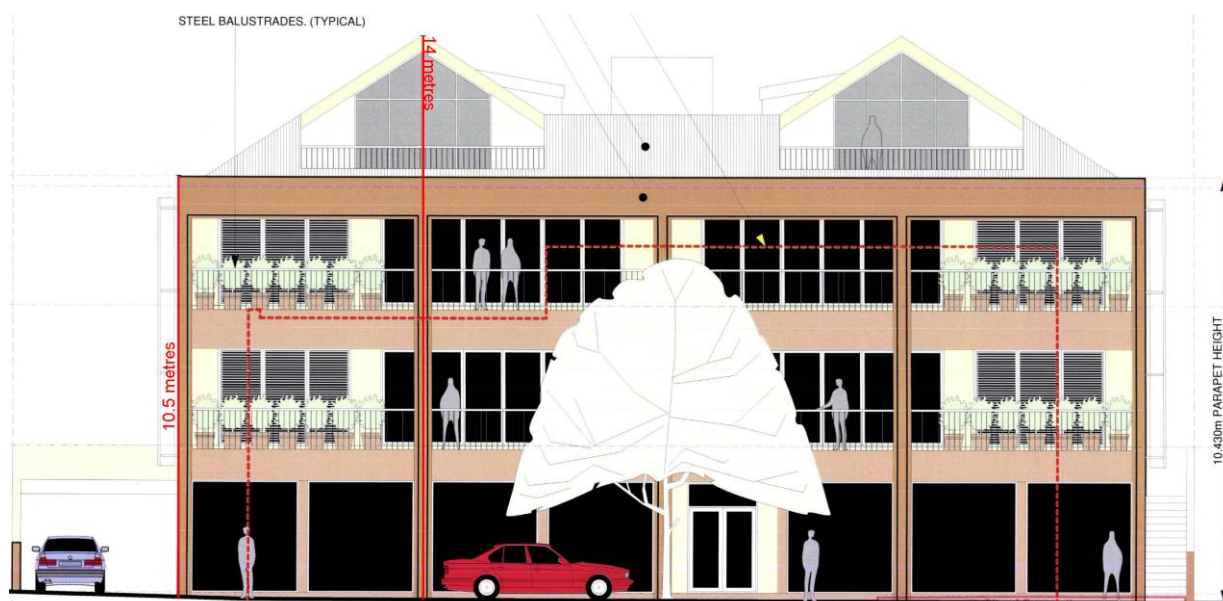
Approved Street Elevation of Proposal Under Application Ref. DA218/10 (Four Storey Mixed Use Development).
